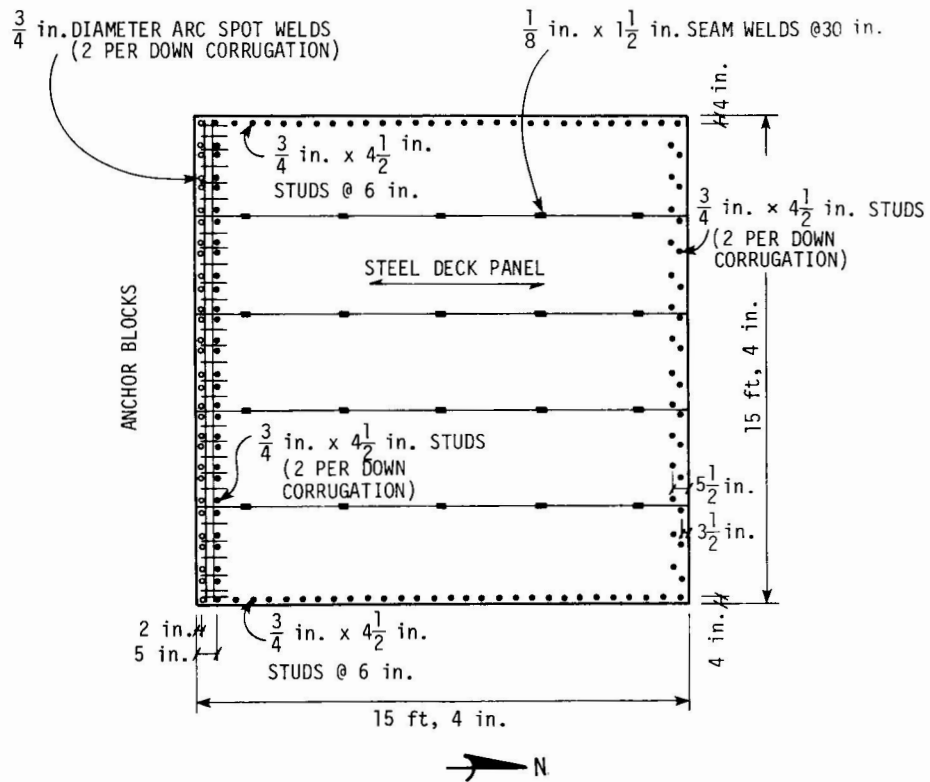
Detailed plan view of pilot test Specimens 1 and 2 (1 ft = 0.304 m; 1 in. = 0.0254 m).
